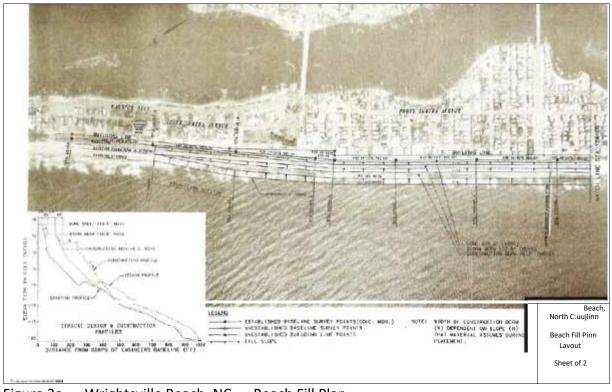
Wrightsville Beach, NC — Beach Fill Plan.
